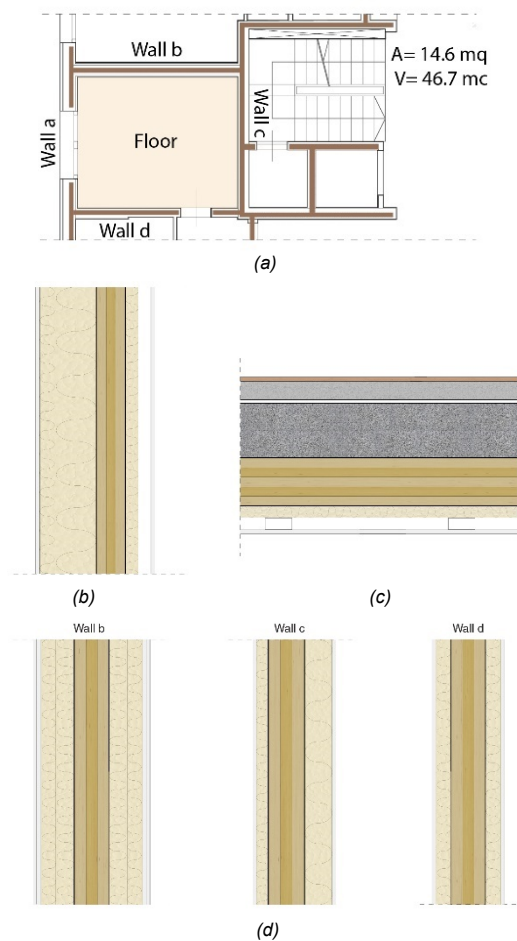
Distribution of the elements in the plan (a) and construction elements: external wall type a (b), separating floor (c) and internal wall (d)
